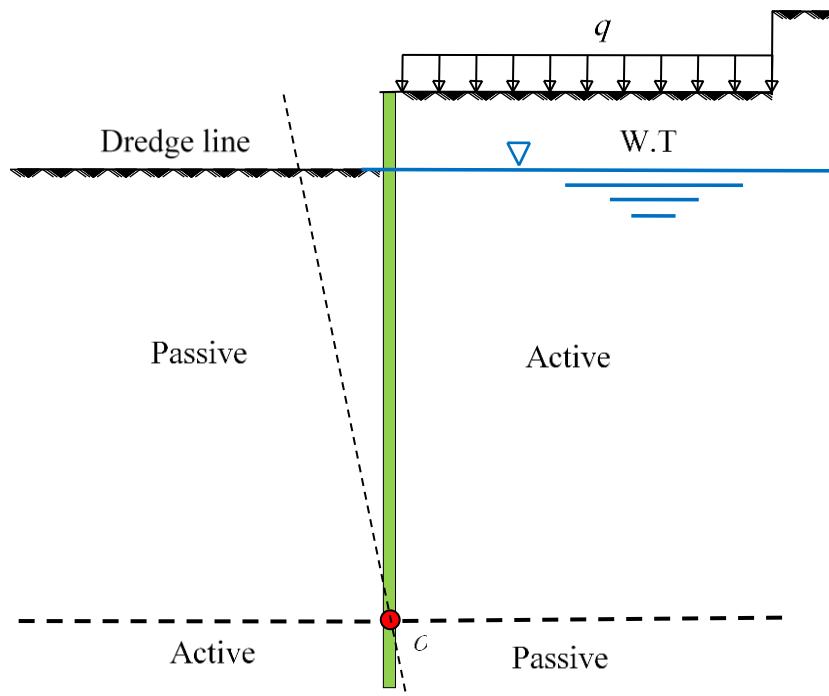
Movement and rotation of the sheet pile wall due to the acting forces
